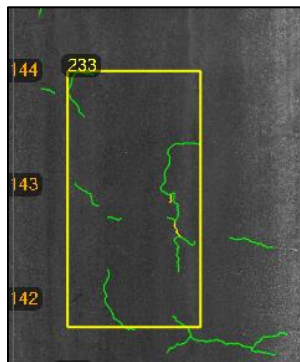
Longitudinal Crack Map of FAST Applied Pavement
